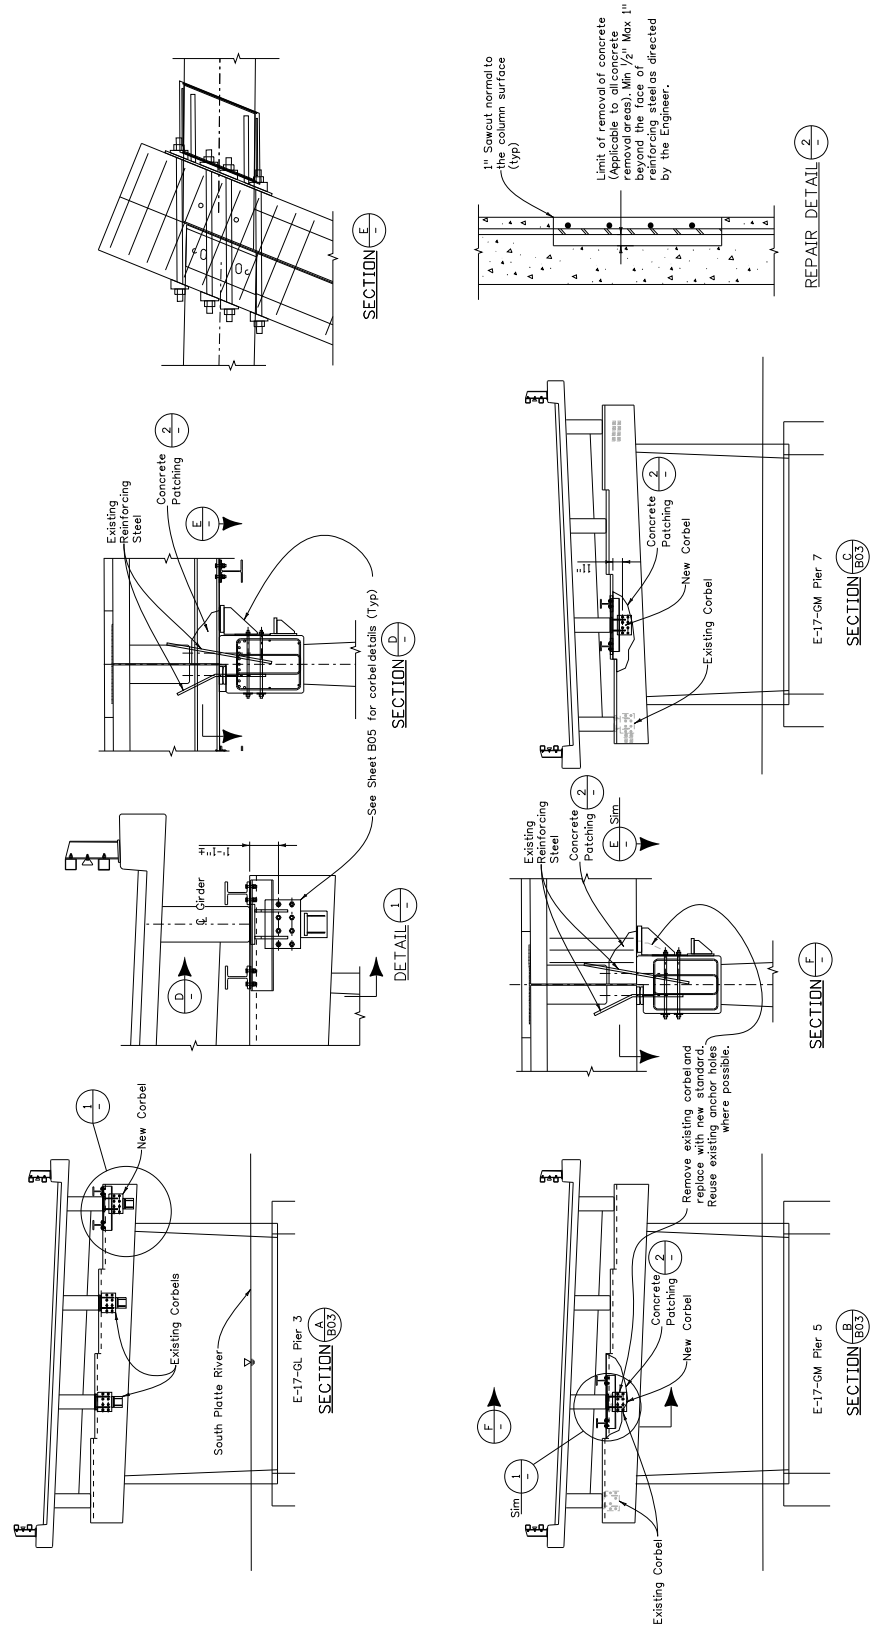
(F)-2 Sample Sections and Elevations for Corbel Placement
